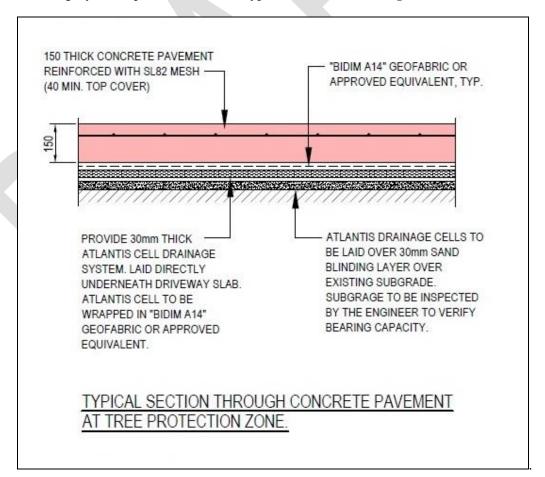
Concrete pavement with Atlantis Drainage Cell beneath to permit some moisture percolation and aeration to the underlying root zone. [Ref: ACOR Consultants (Aust)].
